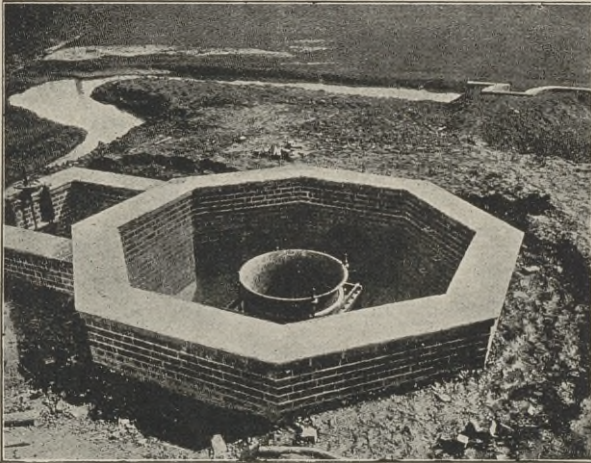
Adjustable Beil-mouth Overflow, with Telescopic Joint and Penstock Valve on Sewer to Outfall Works
